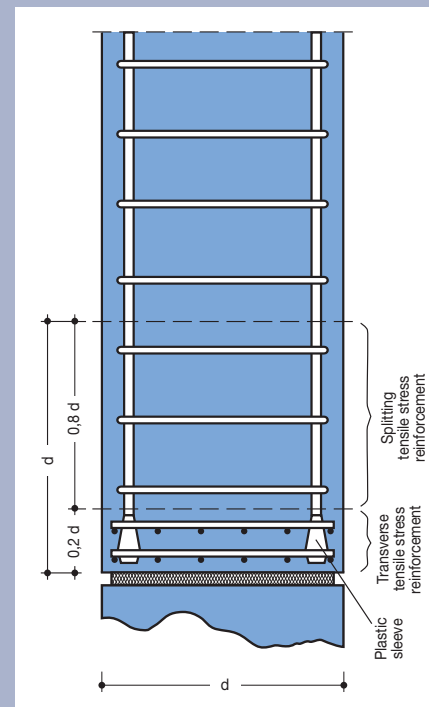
Reinforcement arrangement in the column end zone in accordance with Book 339 DAfStb
